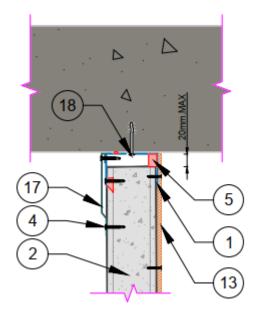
Dual wall system with vertical wall between horizontal walls – vertical head detail – option 01
